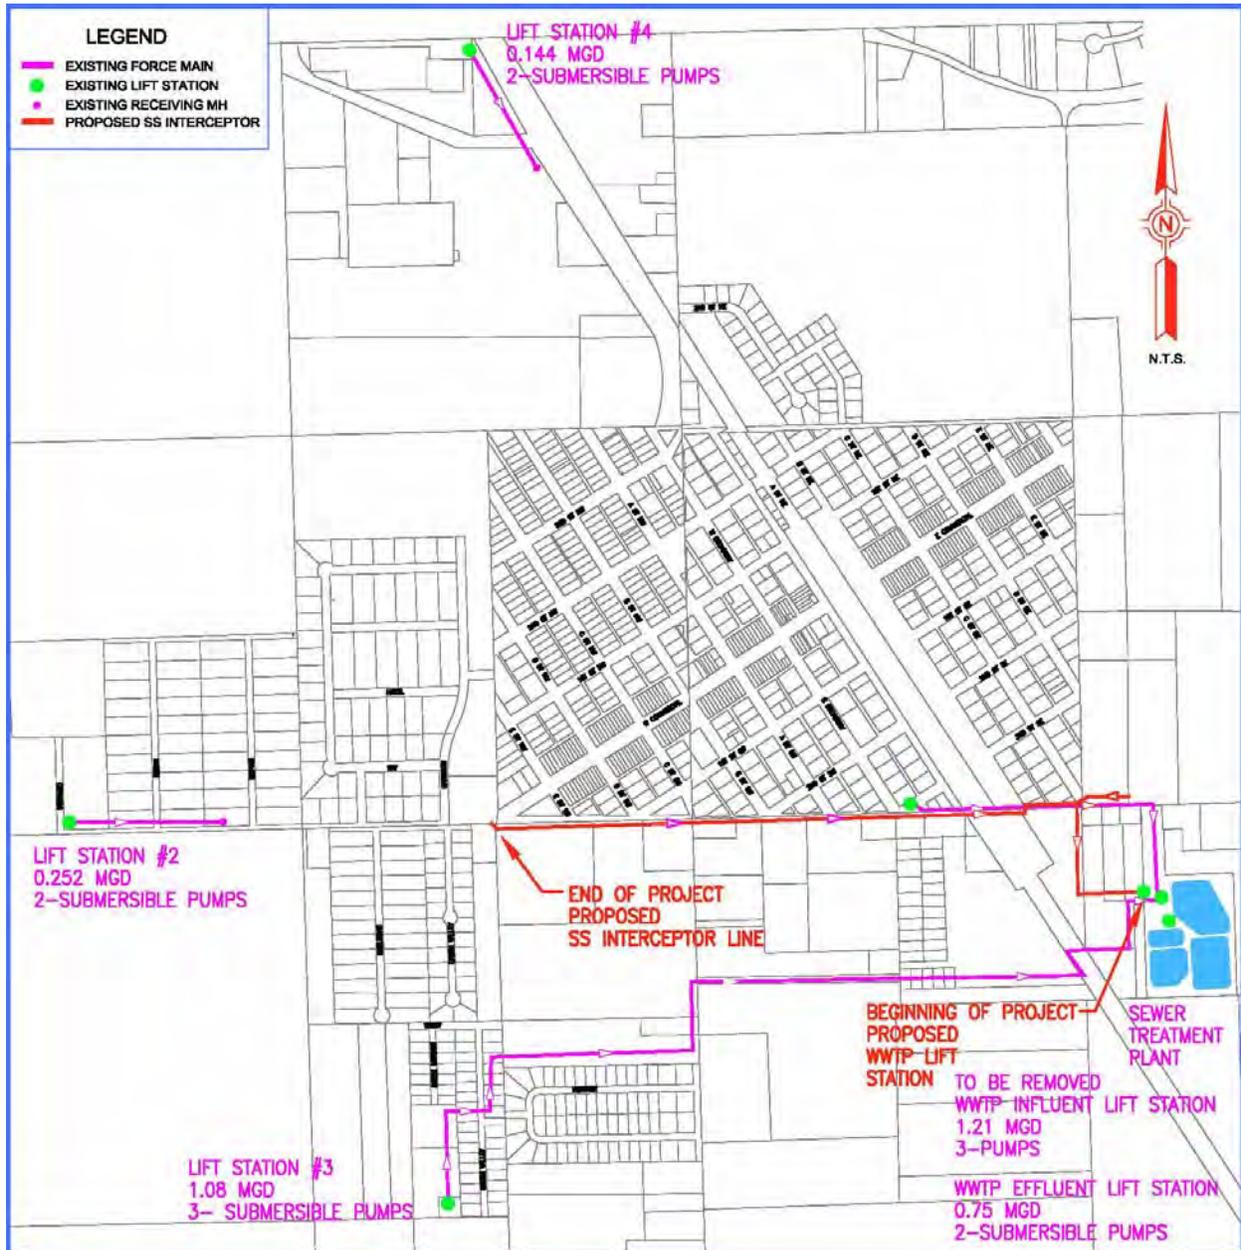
Existing Sanitary Sewer System (Lift Station & Force Mains)
